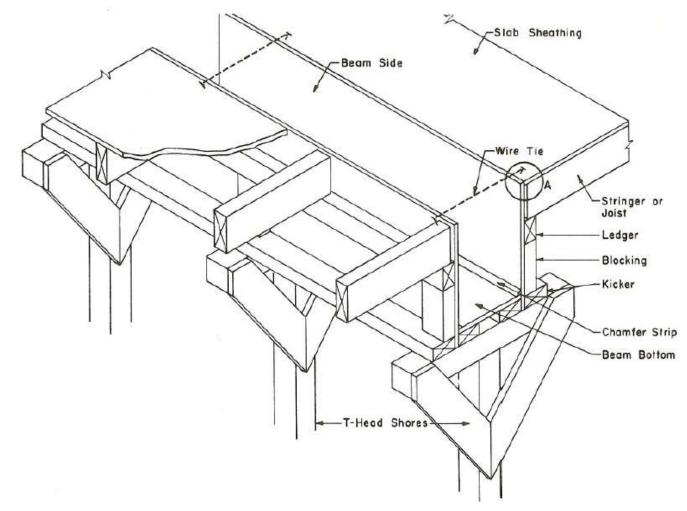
One-way slab form. (Courtesy of American Concrete Institute)
